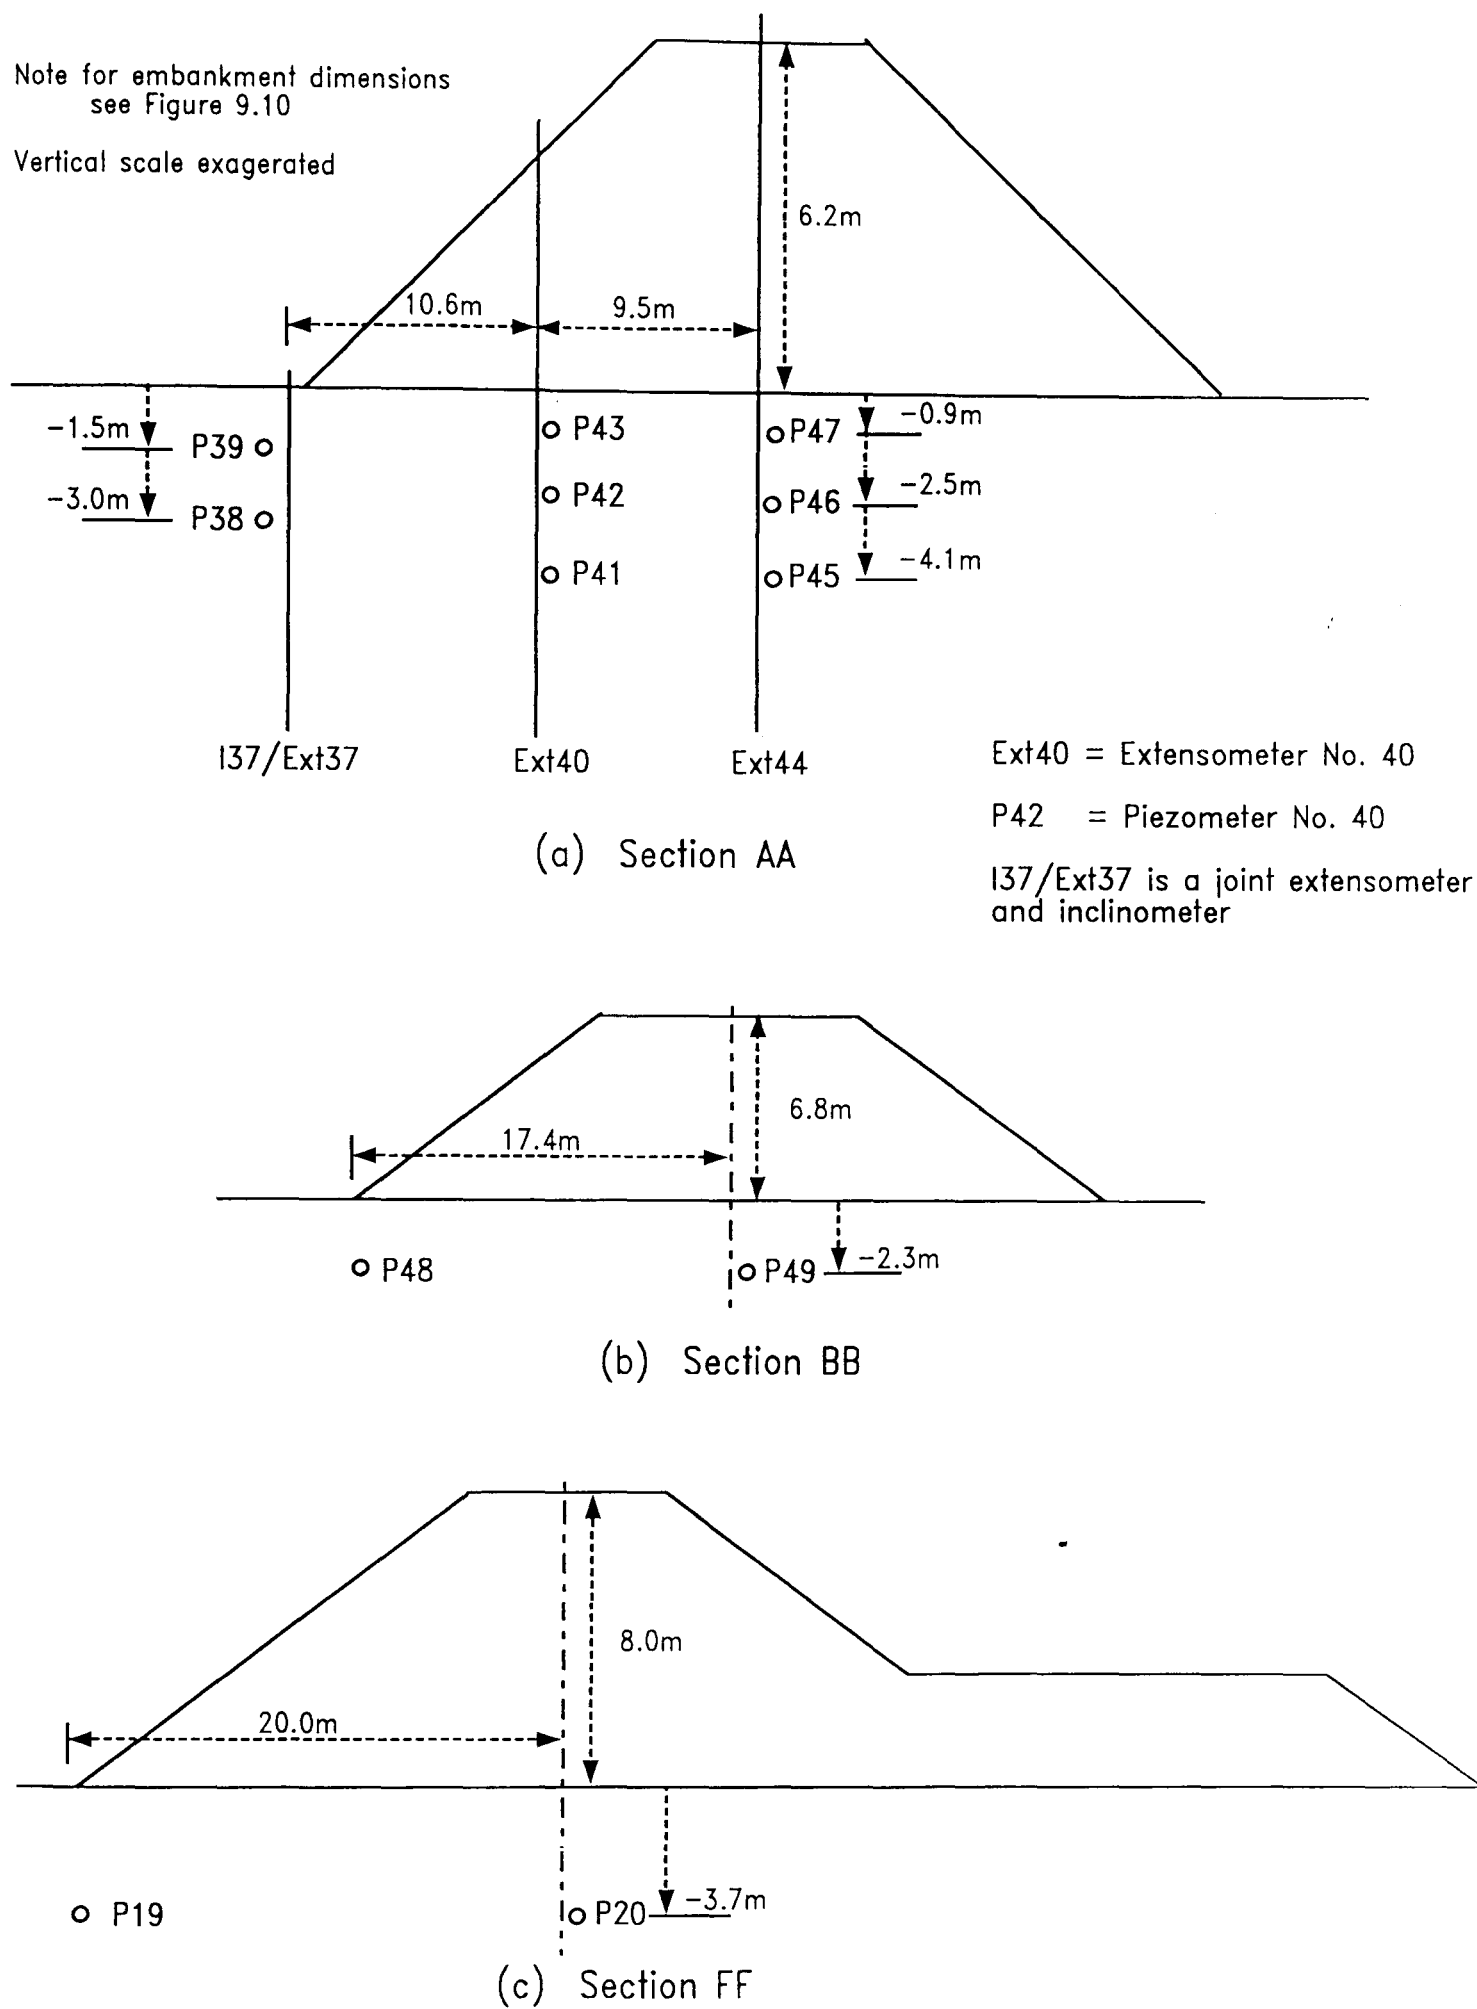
Position of instrumentation at sections AA, BB and FF
